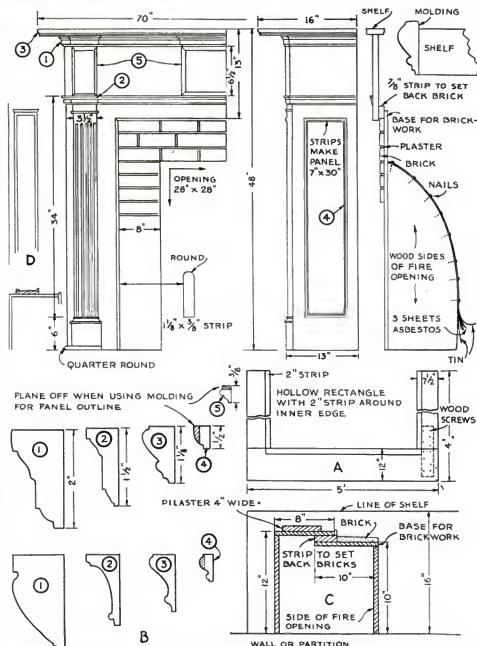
Assembly drawings of the portable fireplace and details showing points in the construction. Four alternate designs, having hearths, are shown in the sketches on page 100
